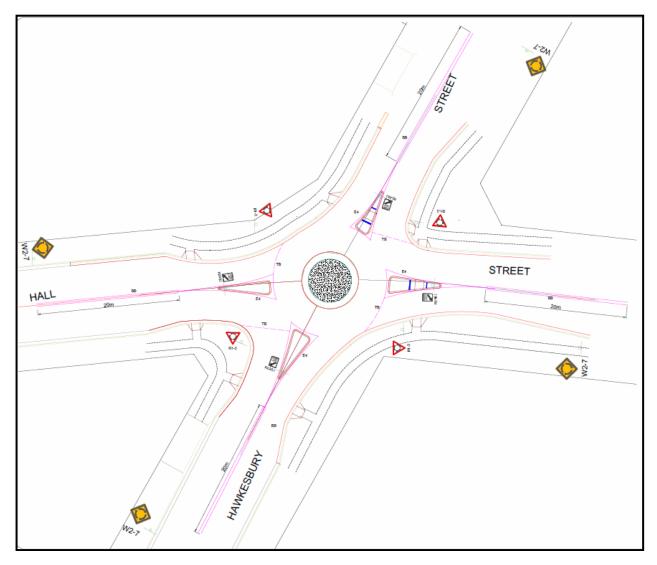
Proposed Intersection Layout for Hall Street – Hawkesbury Street
